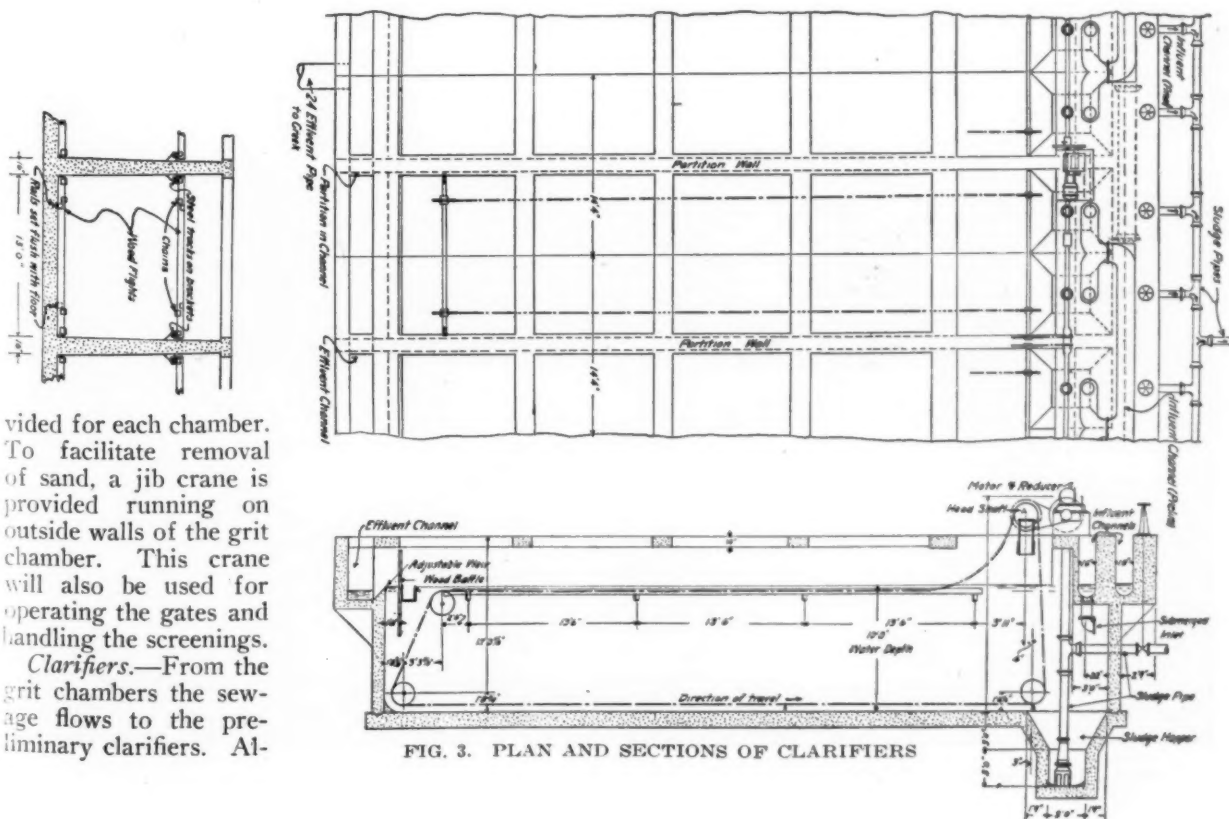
PLAN AND SECTIONS OF CLARIFIERS
